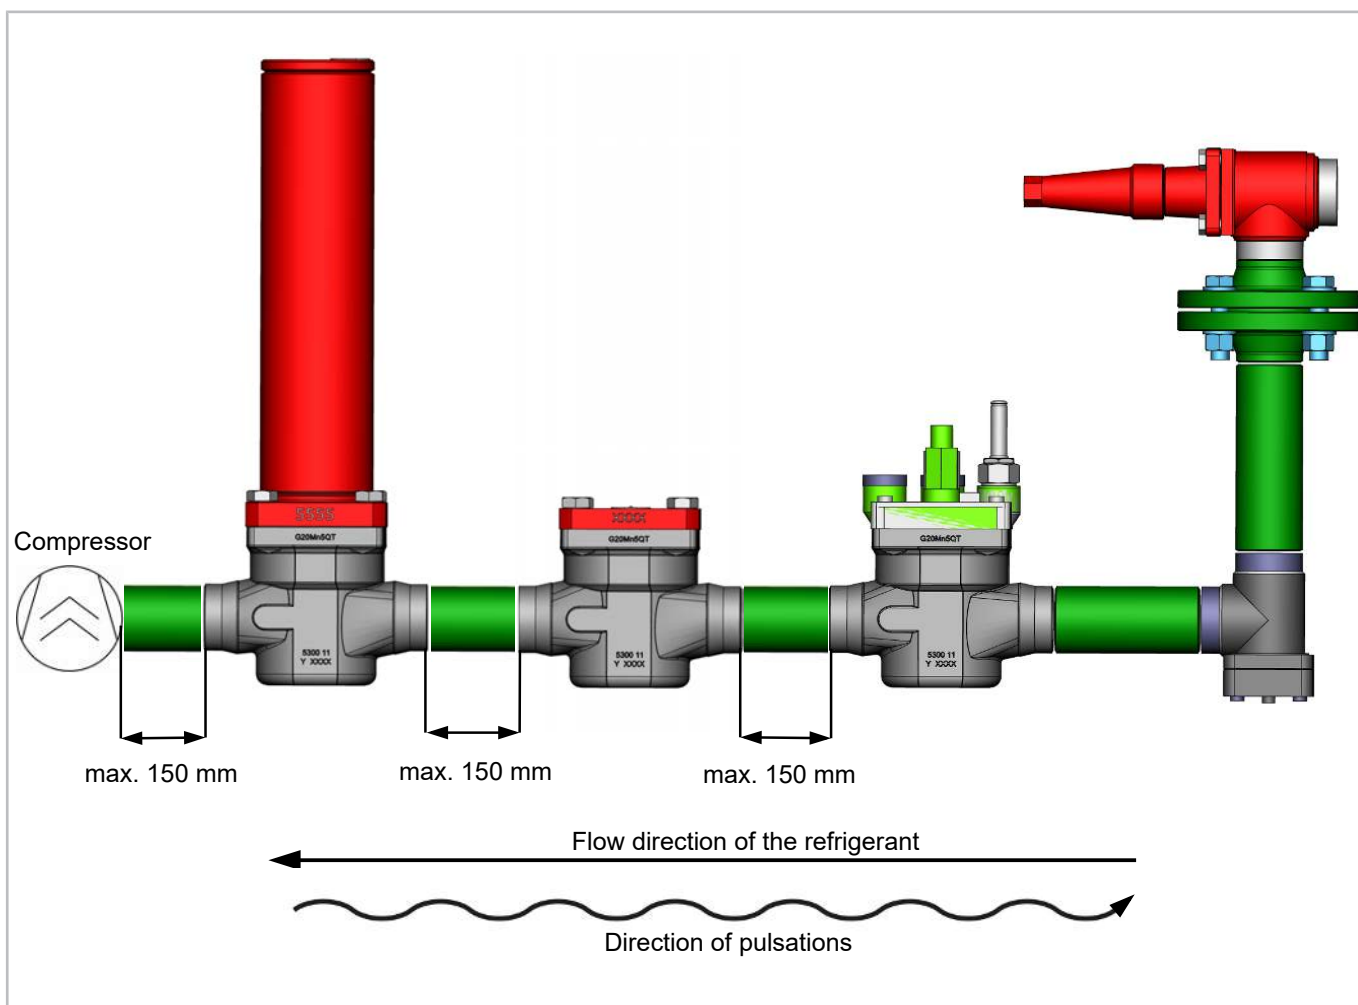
Muffler system, consisting of muffler, check valve, control valve
